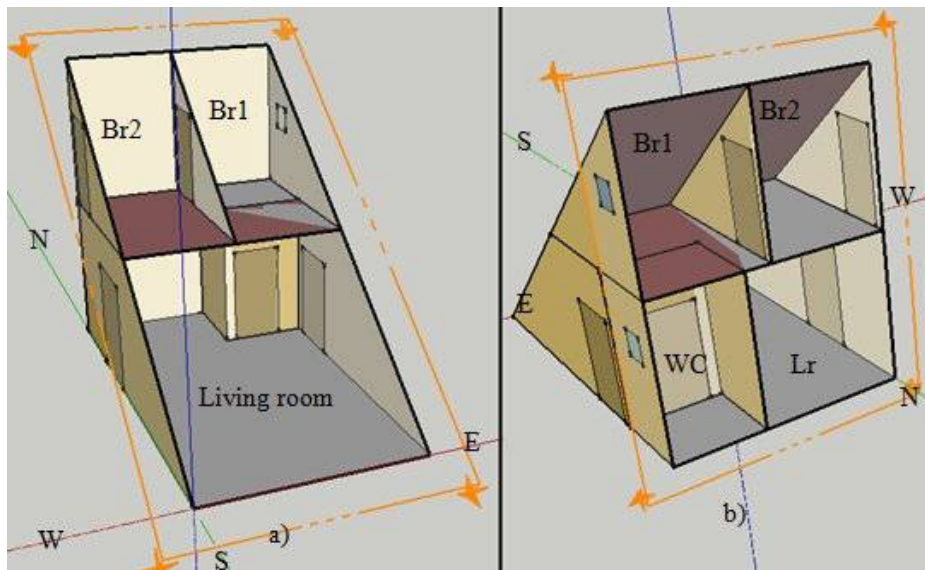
Geometrical definition of the residential house (Br-bedroom, Lr-Living room, WC-Bathroom) (a) South side; (b) North side.
